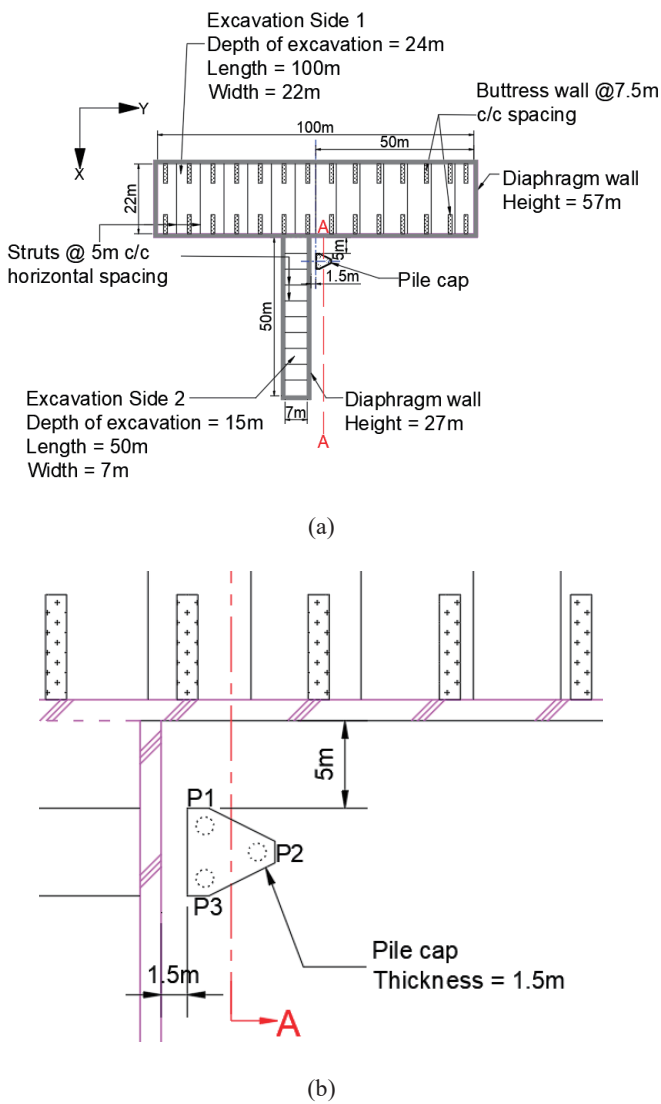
Excavation geometry (a) plan and (b) enlarged view of pile cap area.
